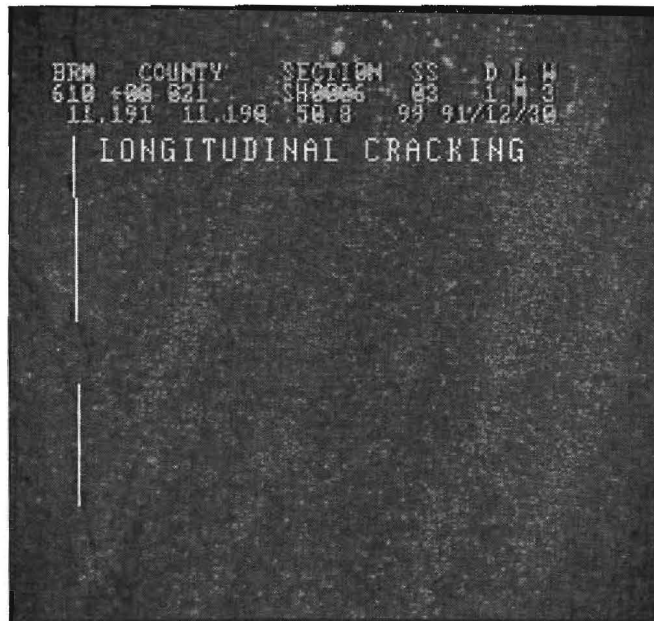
Longitudinal Cracking on Seal Coat Surface.
